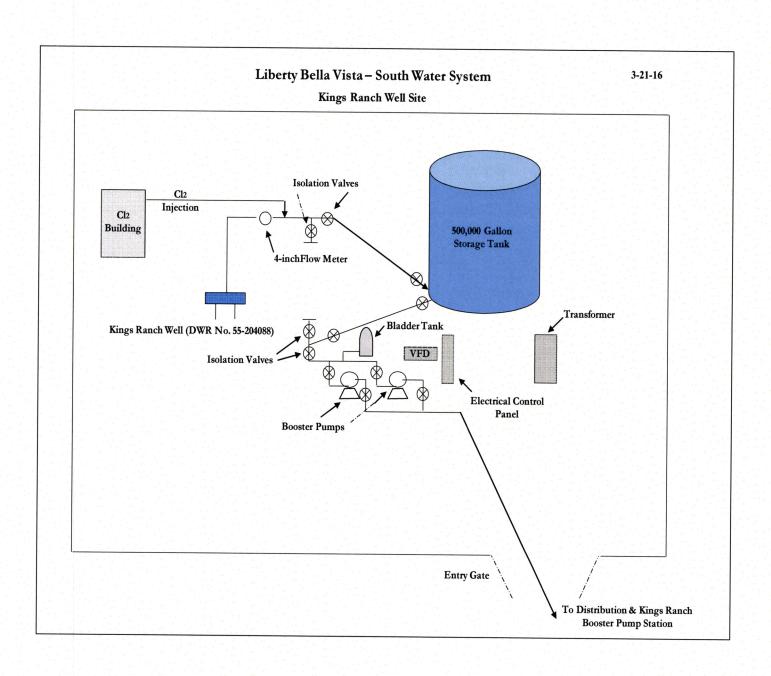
SOUTH WATER SYSTEM KINGS RANCH WELL SITE
